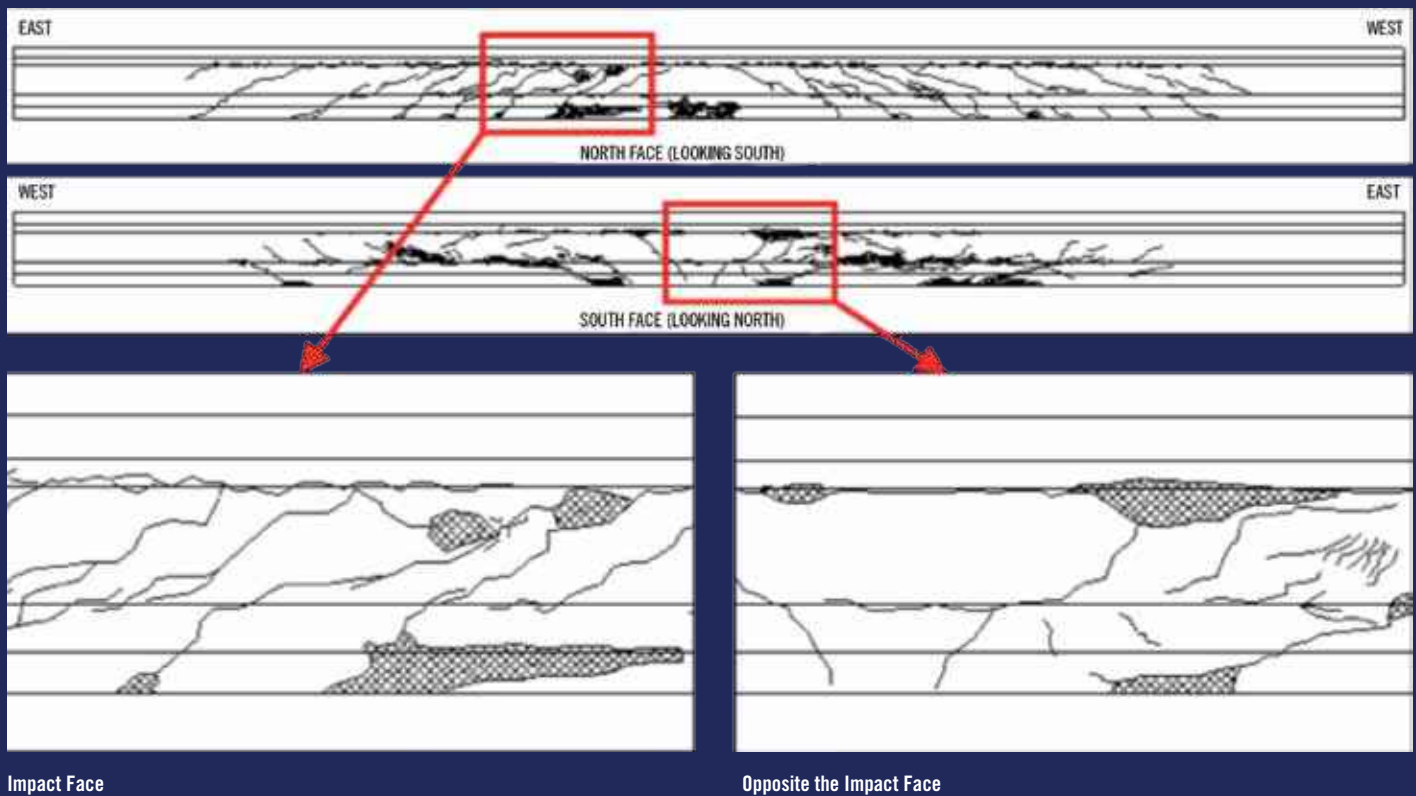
Crack Mapping of the Damaged Girder.
